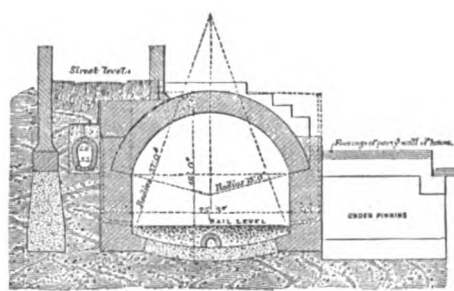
shows a very difficult piece of work in passing through and under some heavy warehouses. The street or lane (Cloak Lane) was but fifteen feet wide, and the footings of the walls were 27 feet below street-level. The first step was to underpin the wall of the building on
